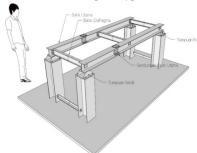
Laboratory scale bridge test And test trust of bridge already started, as define in figure 5.
